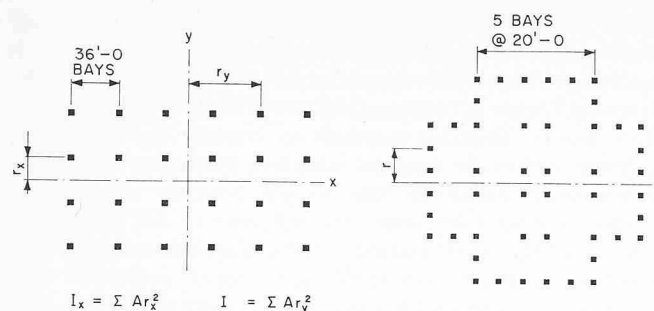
When all column elements are connected to each other in such a way that the entire building acts as a hollow tube or rigid box cantilevering out of the ground, the overturning resistance as well as the overturning stresses in the columns would be direct tension or compression without any bending, and the column system can be expressed as shown
